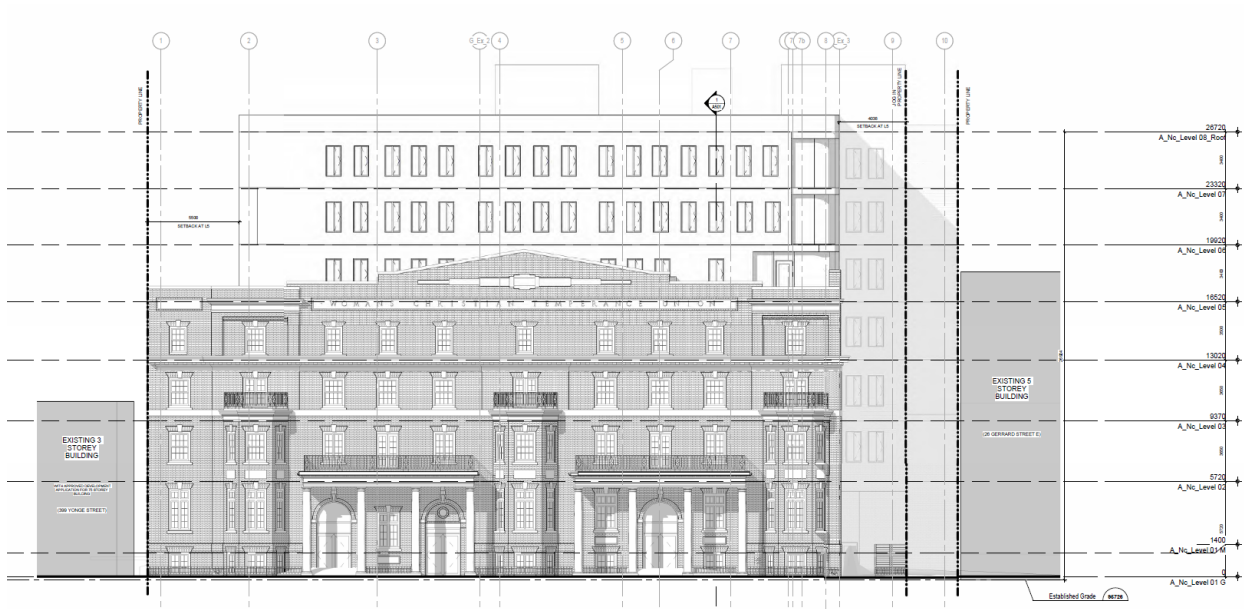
South elevation drawing included for illustration purposes (ERA Architects Inc., March 3, 2026).
